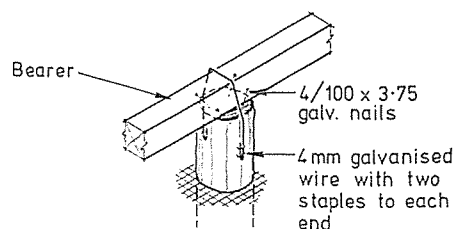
Fixing of bearers and jack studs to ordinary piles
